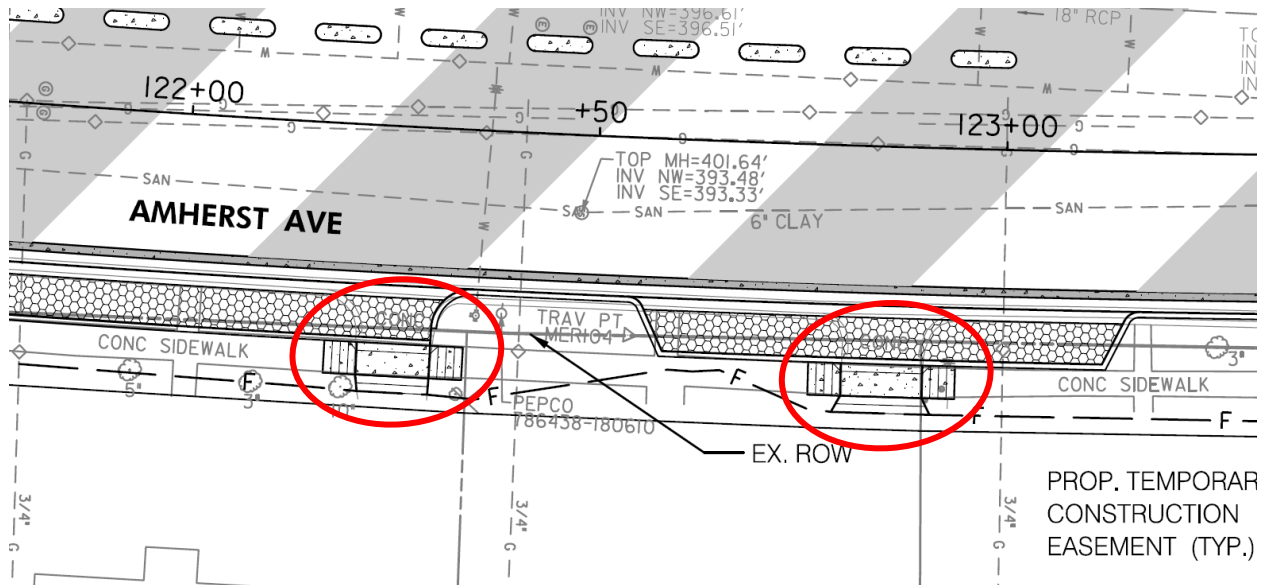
Examples of driveway aprons narrowing sidewalk space between Prichard Road and Reedie Drive (light grey lines reflect existing conditions, dark lines represent proposed changes)
